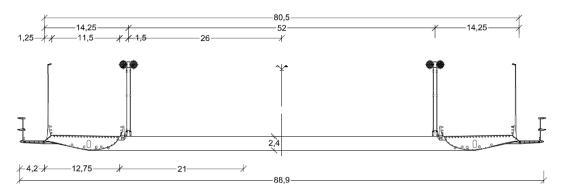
Cross-section of the deck with main suspension cables spaced 52 m apart.
